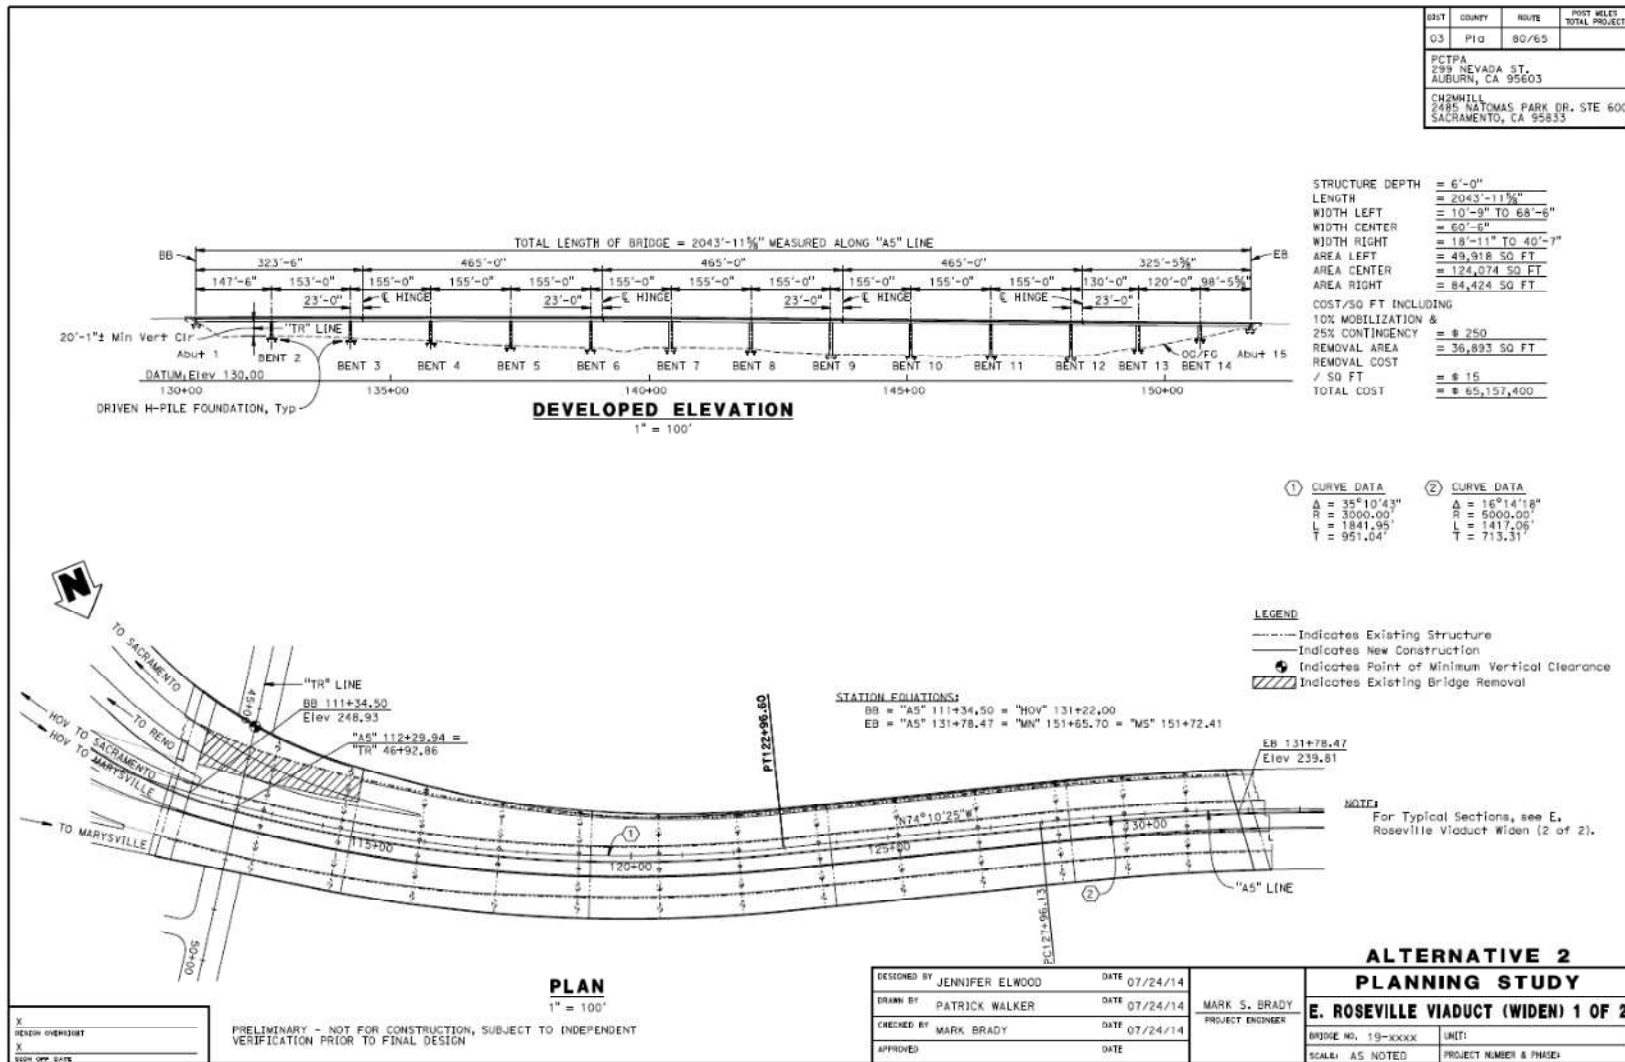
East Roseville Viaduct Proposed Bridge Plan (Alternative 2) (1 of 2)
